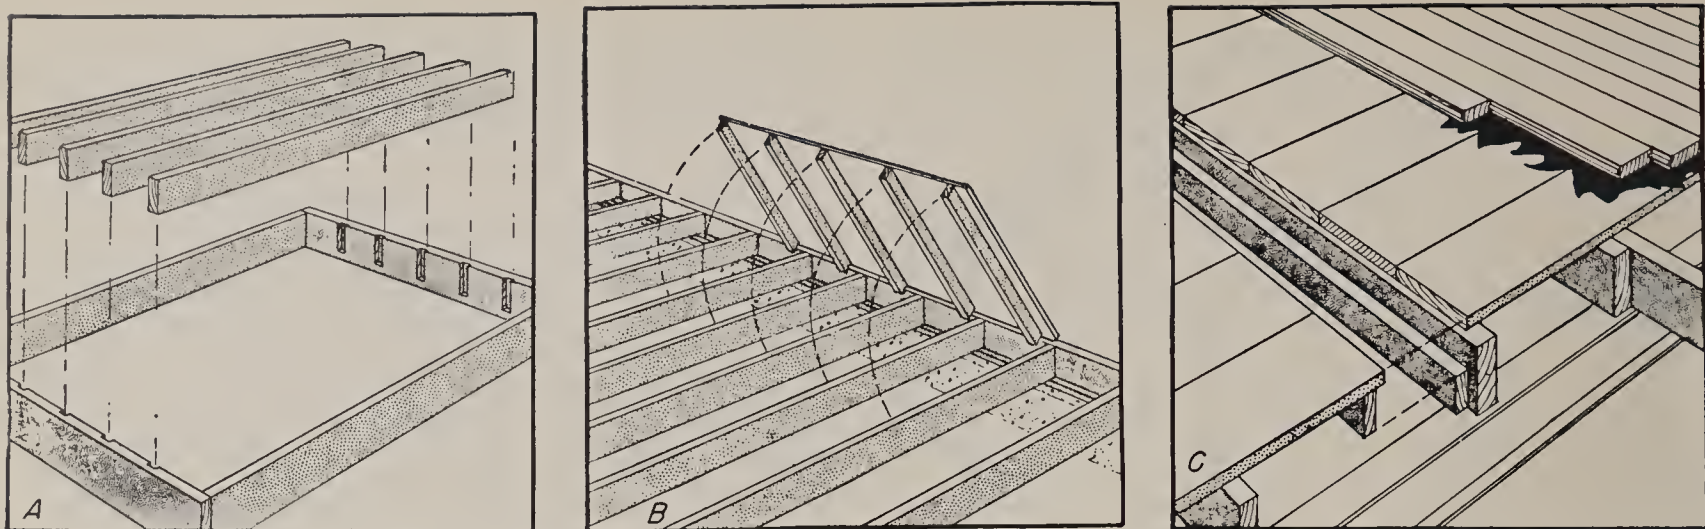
Three methods of flooring panelization. *A*, floor panel with grooved headers in which shallower joists are fitted; *B*, conventional joist construction to which floor panels are spiked laterally to the joist; *C*, panelized floor sections fitted with half joists on one side to permit attachment of panels to each other by lateral spiking.
